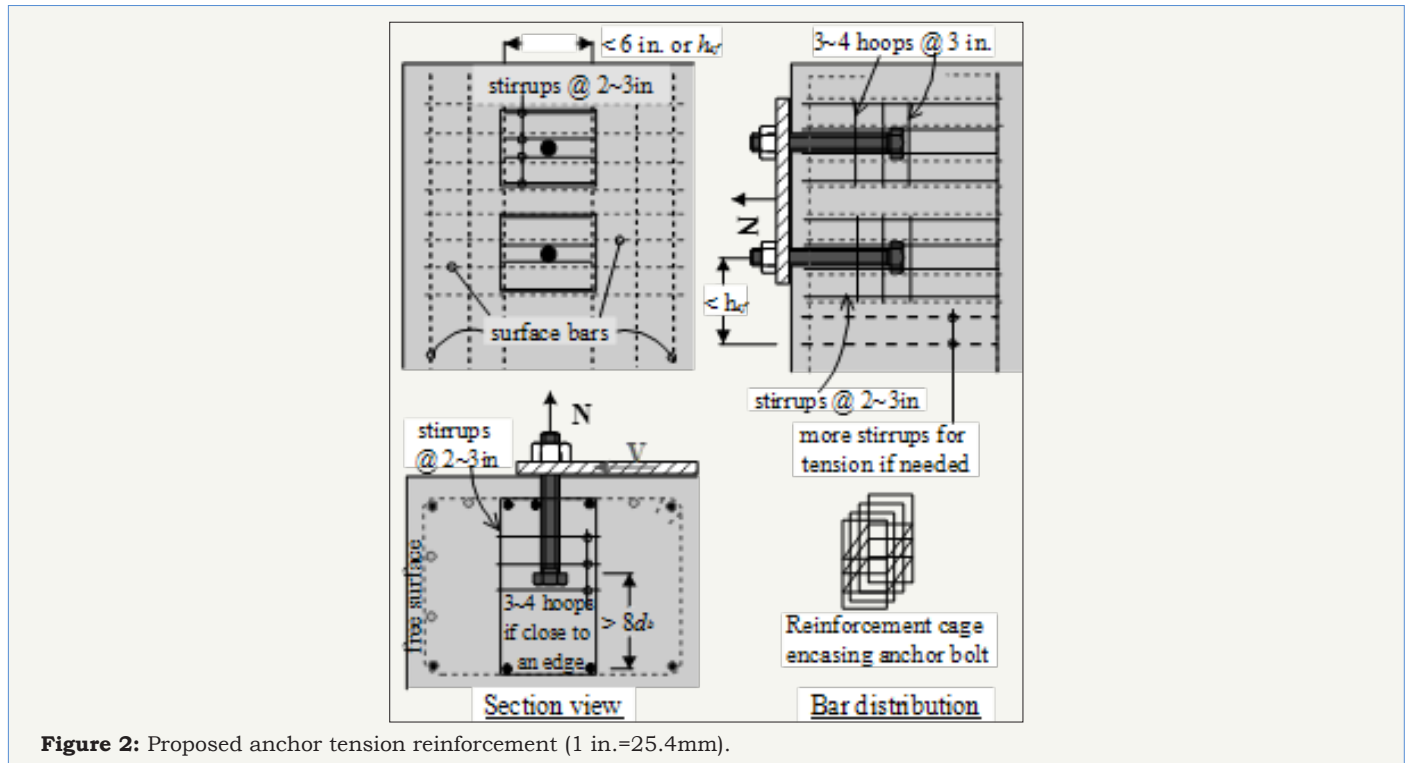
Proposed anchor tension reinforcement (1 in.=25.4mm).
